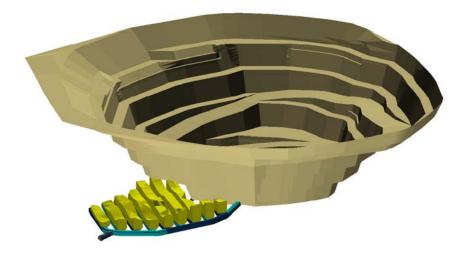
Area 2 Pit and Underground Isometric View looking Northeast
